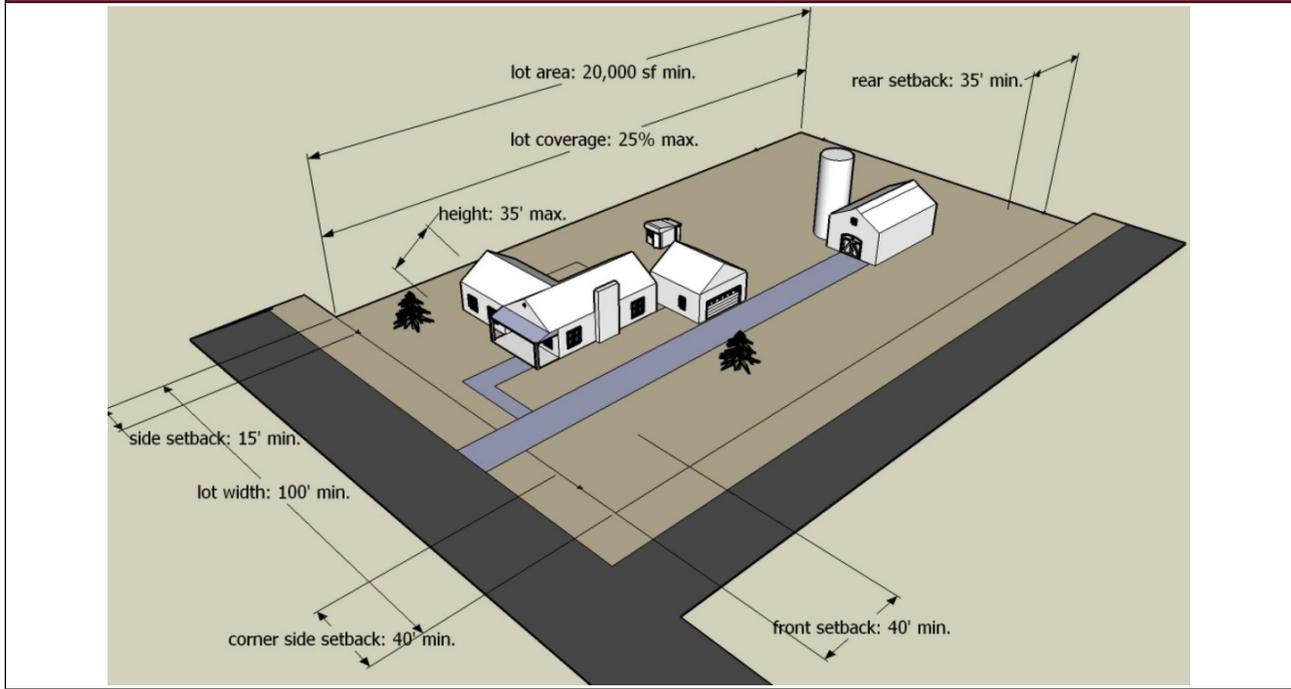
C.3.d: AR Typical Building/Lot Configuration
